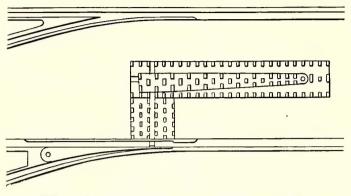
GROUND PLAN OF AUTOMATIC SWITCH
